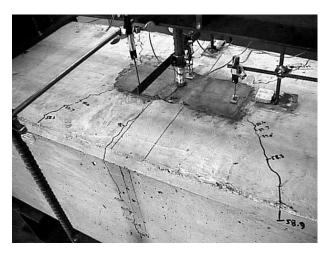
Grout Pocket Corner Cracks (SL03)
